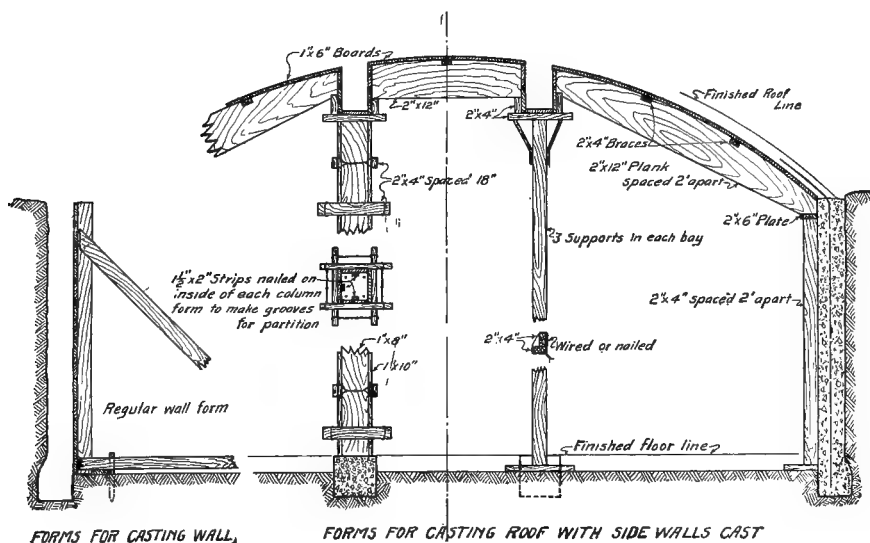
Sectional Detailed View of Root Cellar Wall and Forms.
